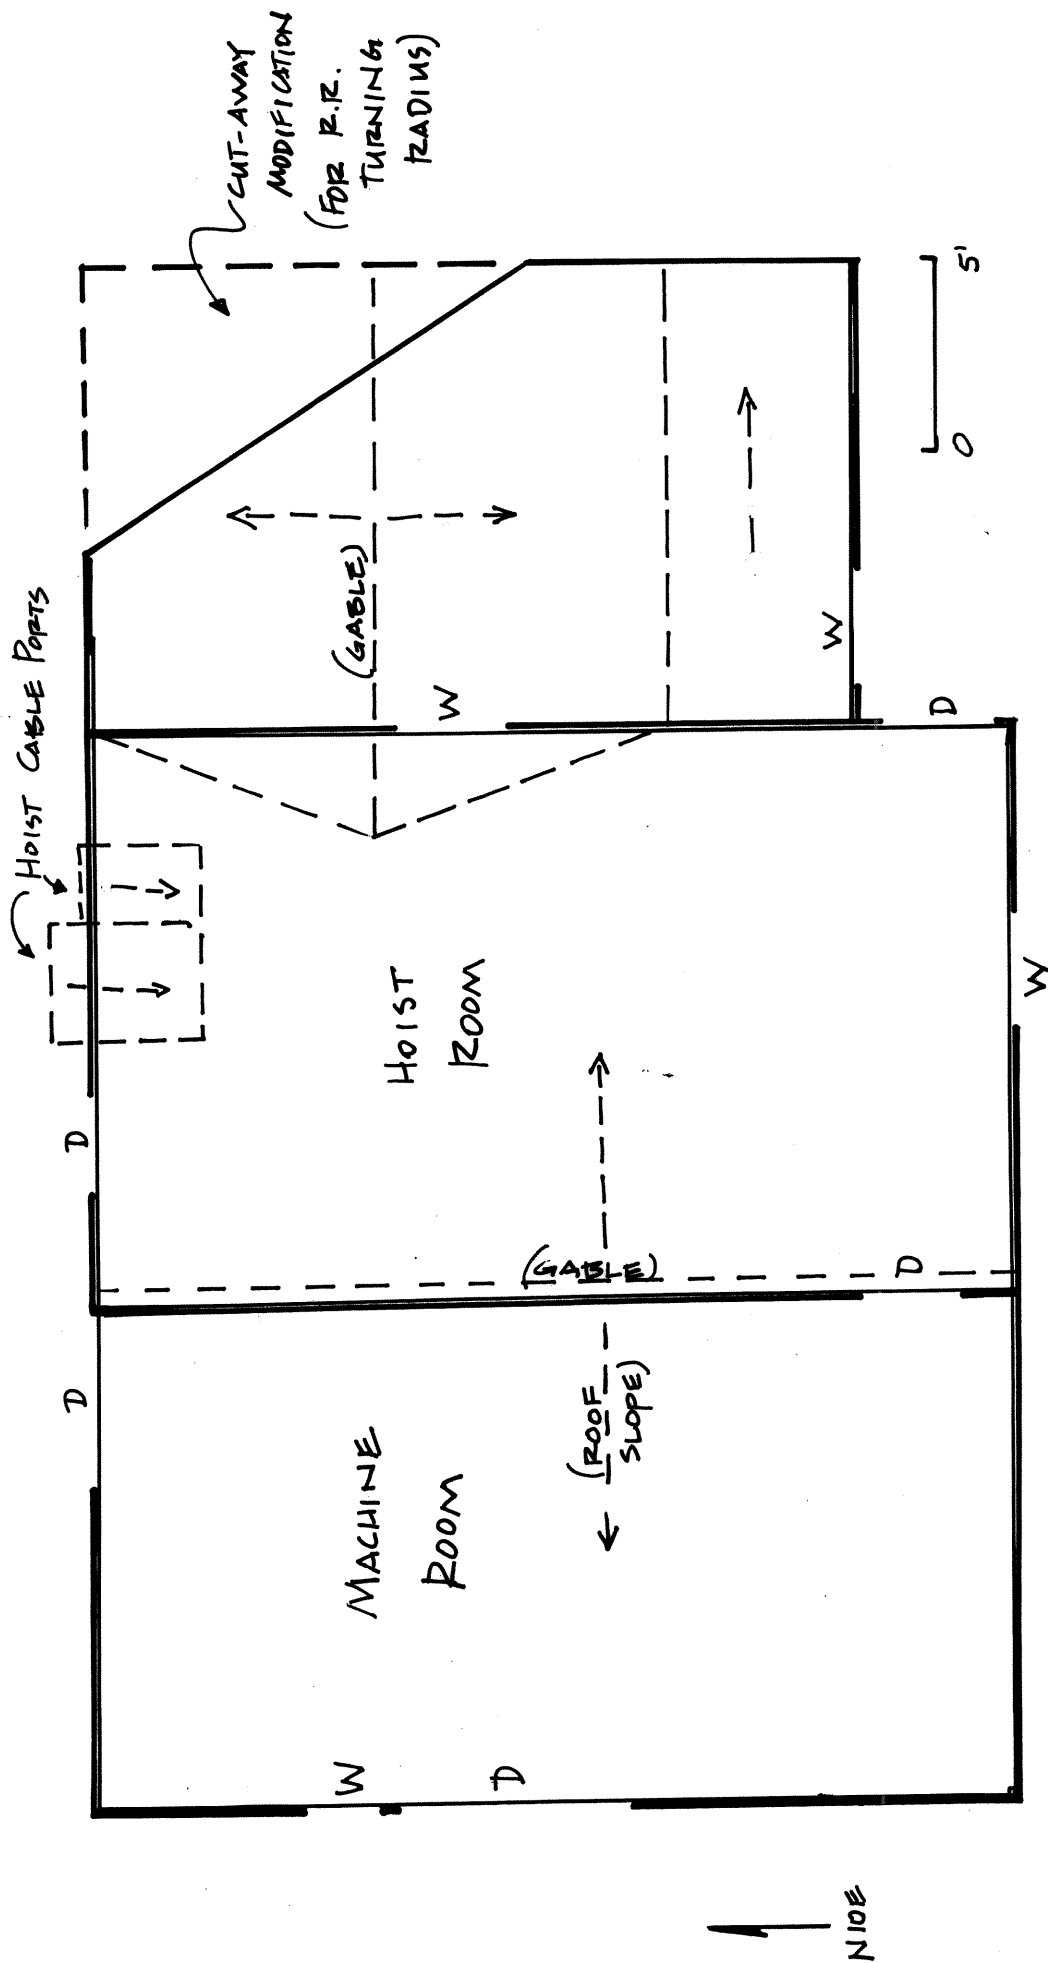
Plan of Hoist house at the Karma site, CA-KER-4448H.
